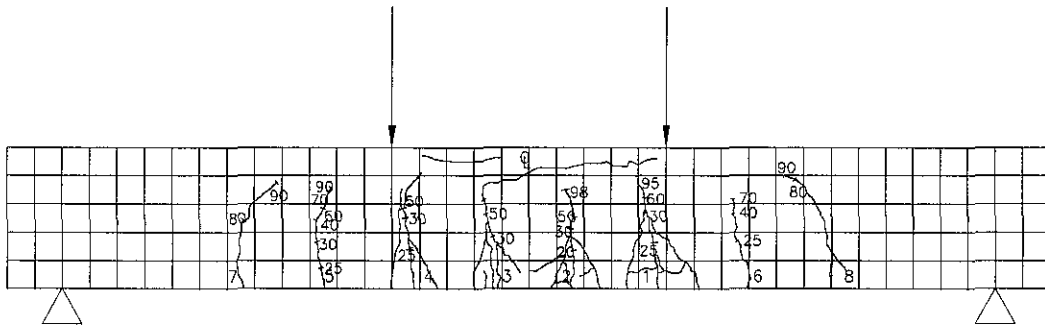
19. Crack pattern of FMSCC beam specimen (flexural failure)
